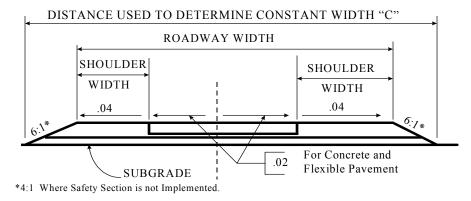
TANGENT SECTION-SINGLE OR DIVIDED HIGHWAY
